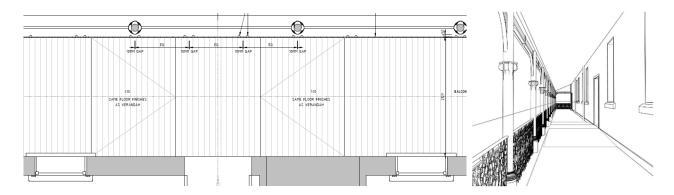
1:10 walkway without handrails or TGSIs extended to new glass balustrade (Option 2)
